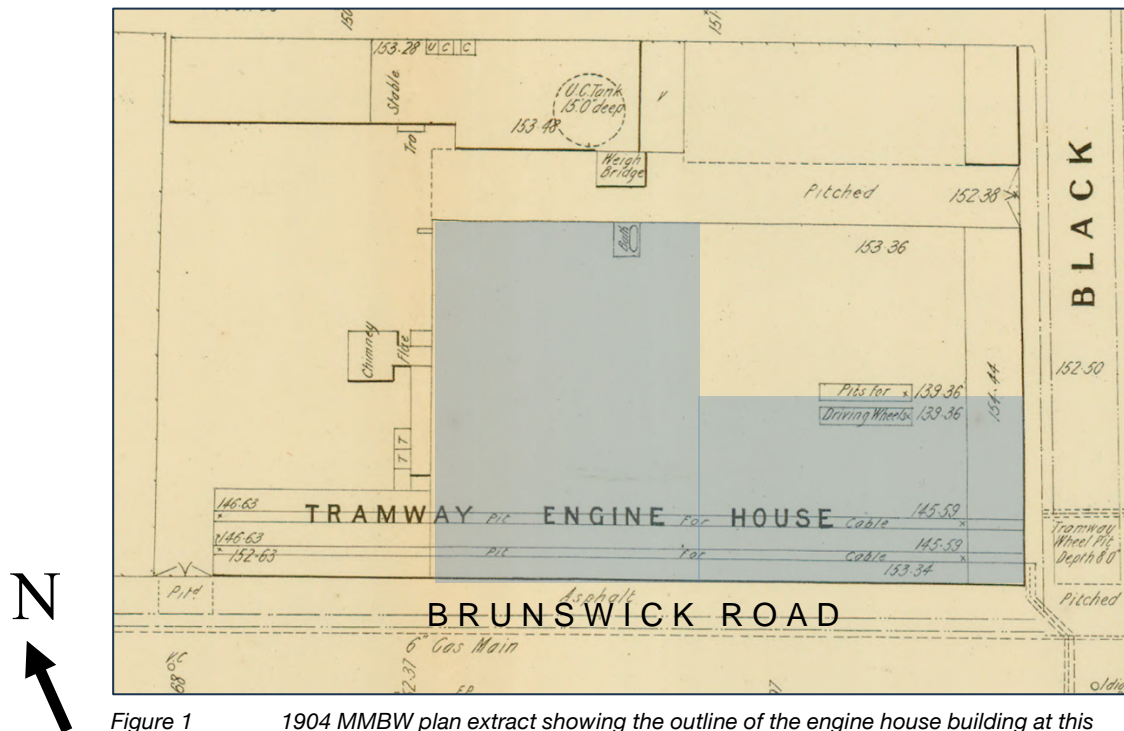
1904 MMBW plan extract showing the outline of the engine house building at this time, including the location of the chimney (on the western side).
